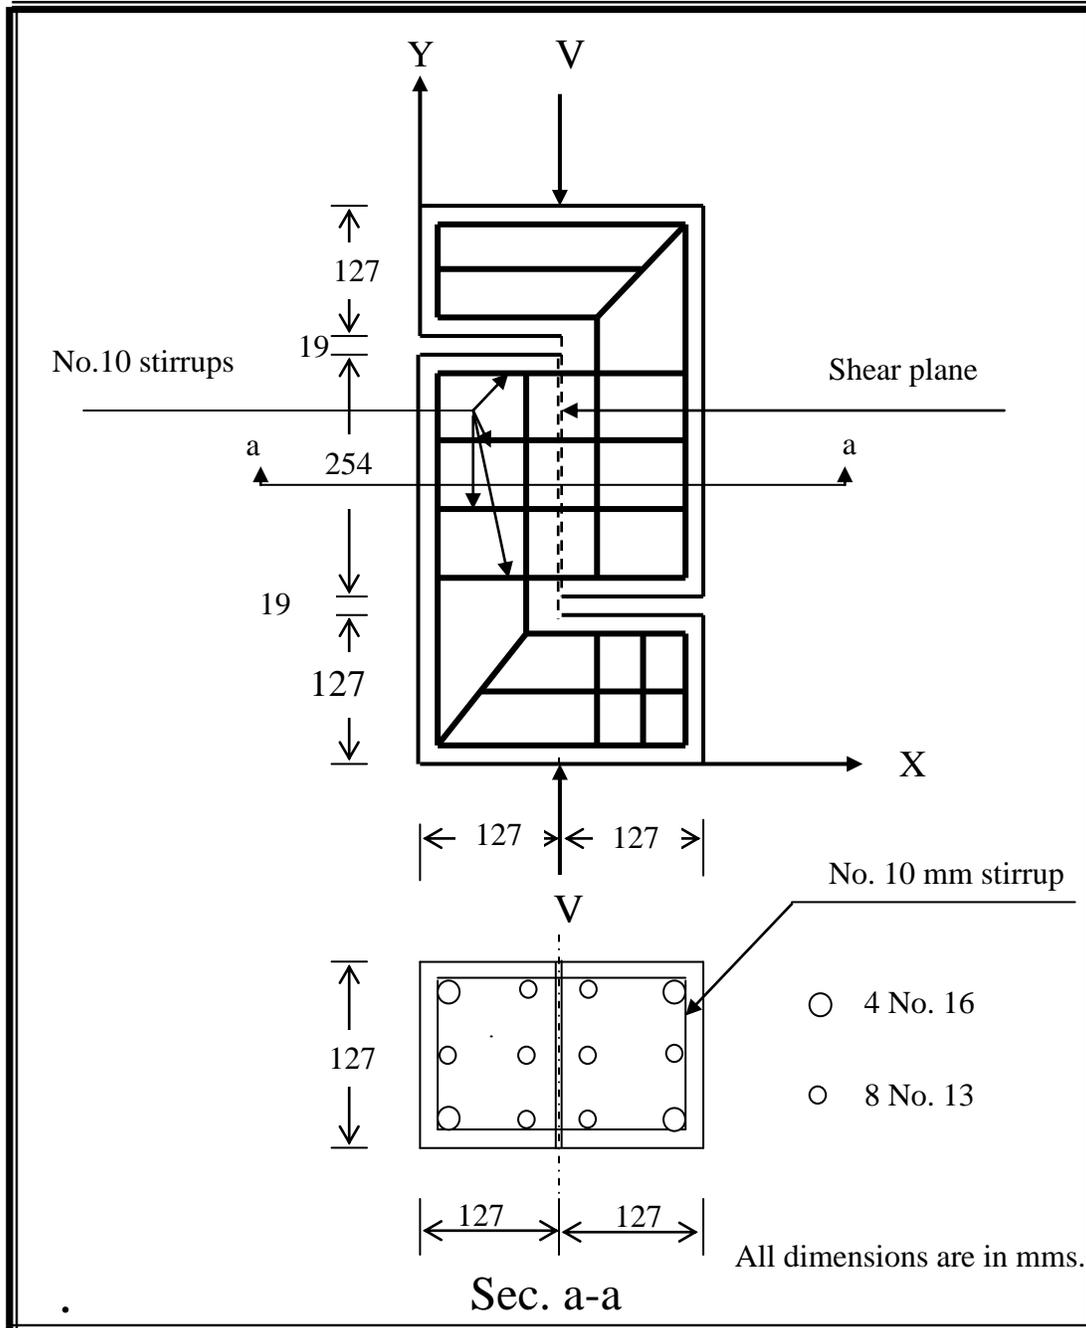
Dimensions and reinforcement details of push-off specimen.
